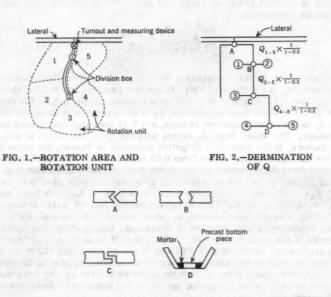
PRECAST CONCRETE SLAB FOR LINING
